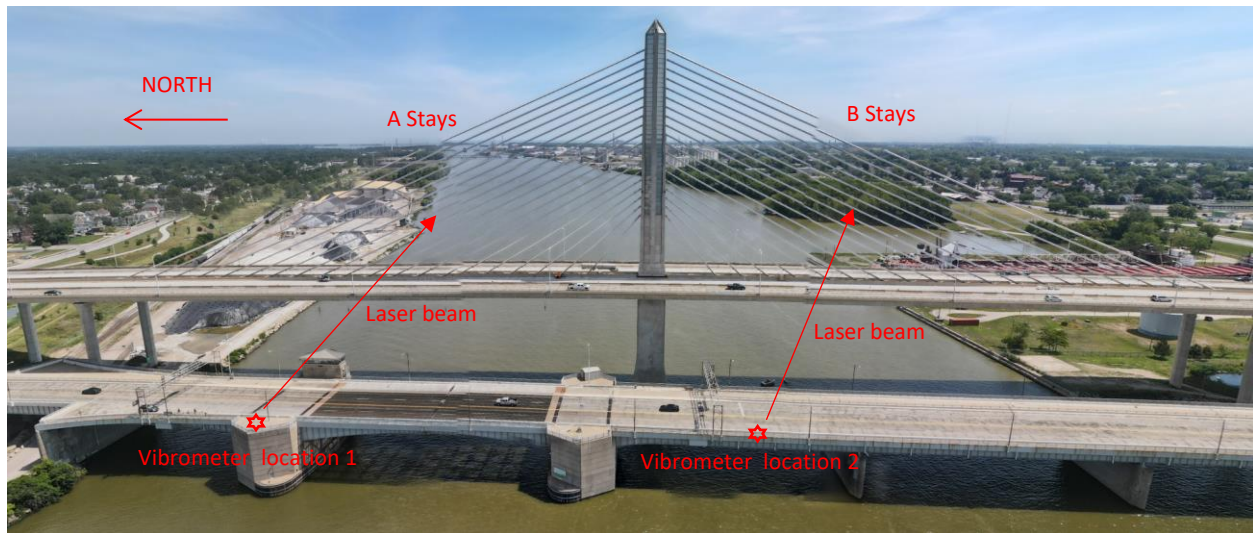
Pilot study setup locations on the Robert Craig Memorial Bridge.
